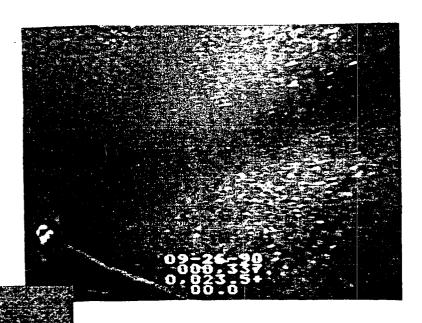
CBZ-#11 to CBZ-#12 Shows over all interior condition of pipe.
